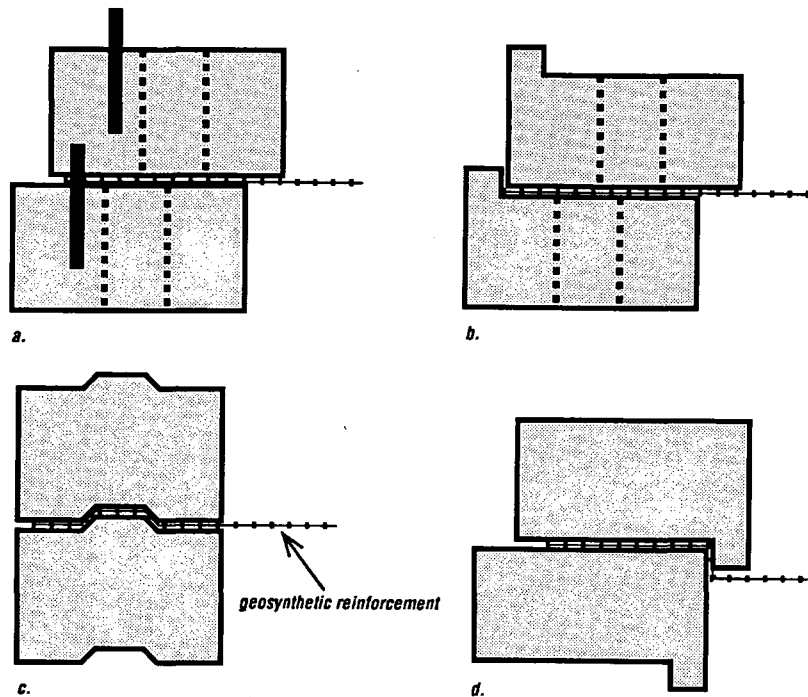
Typical facing block cross sections and connection details: (a) block with alignment/shear pin; (b) block with leading lip; (c) block with shear tray; (d) block with trailing lip.
